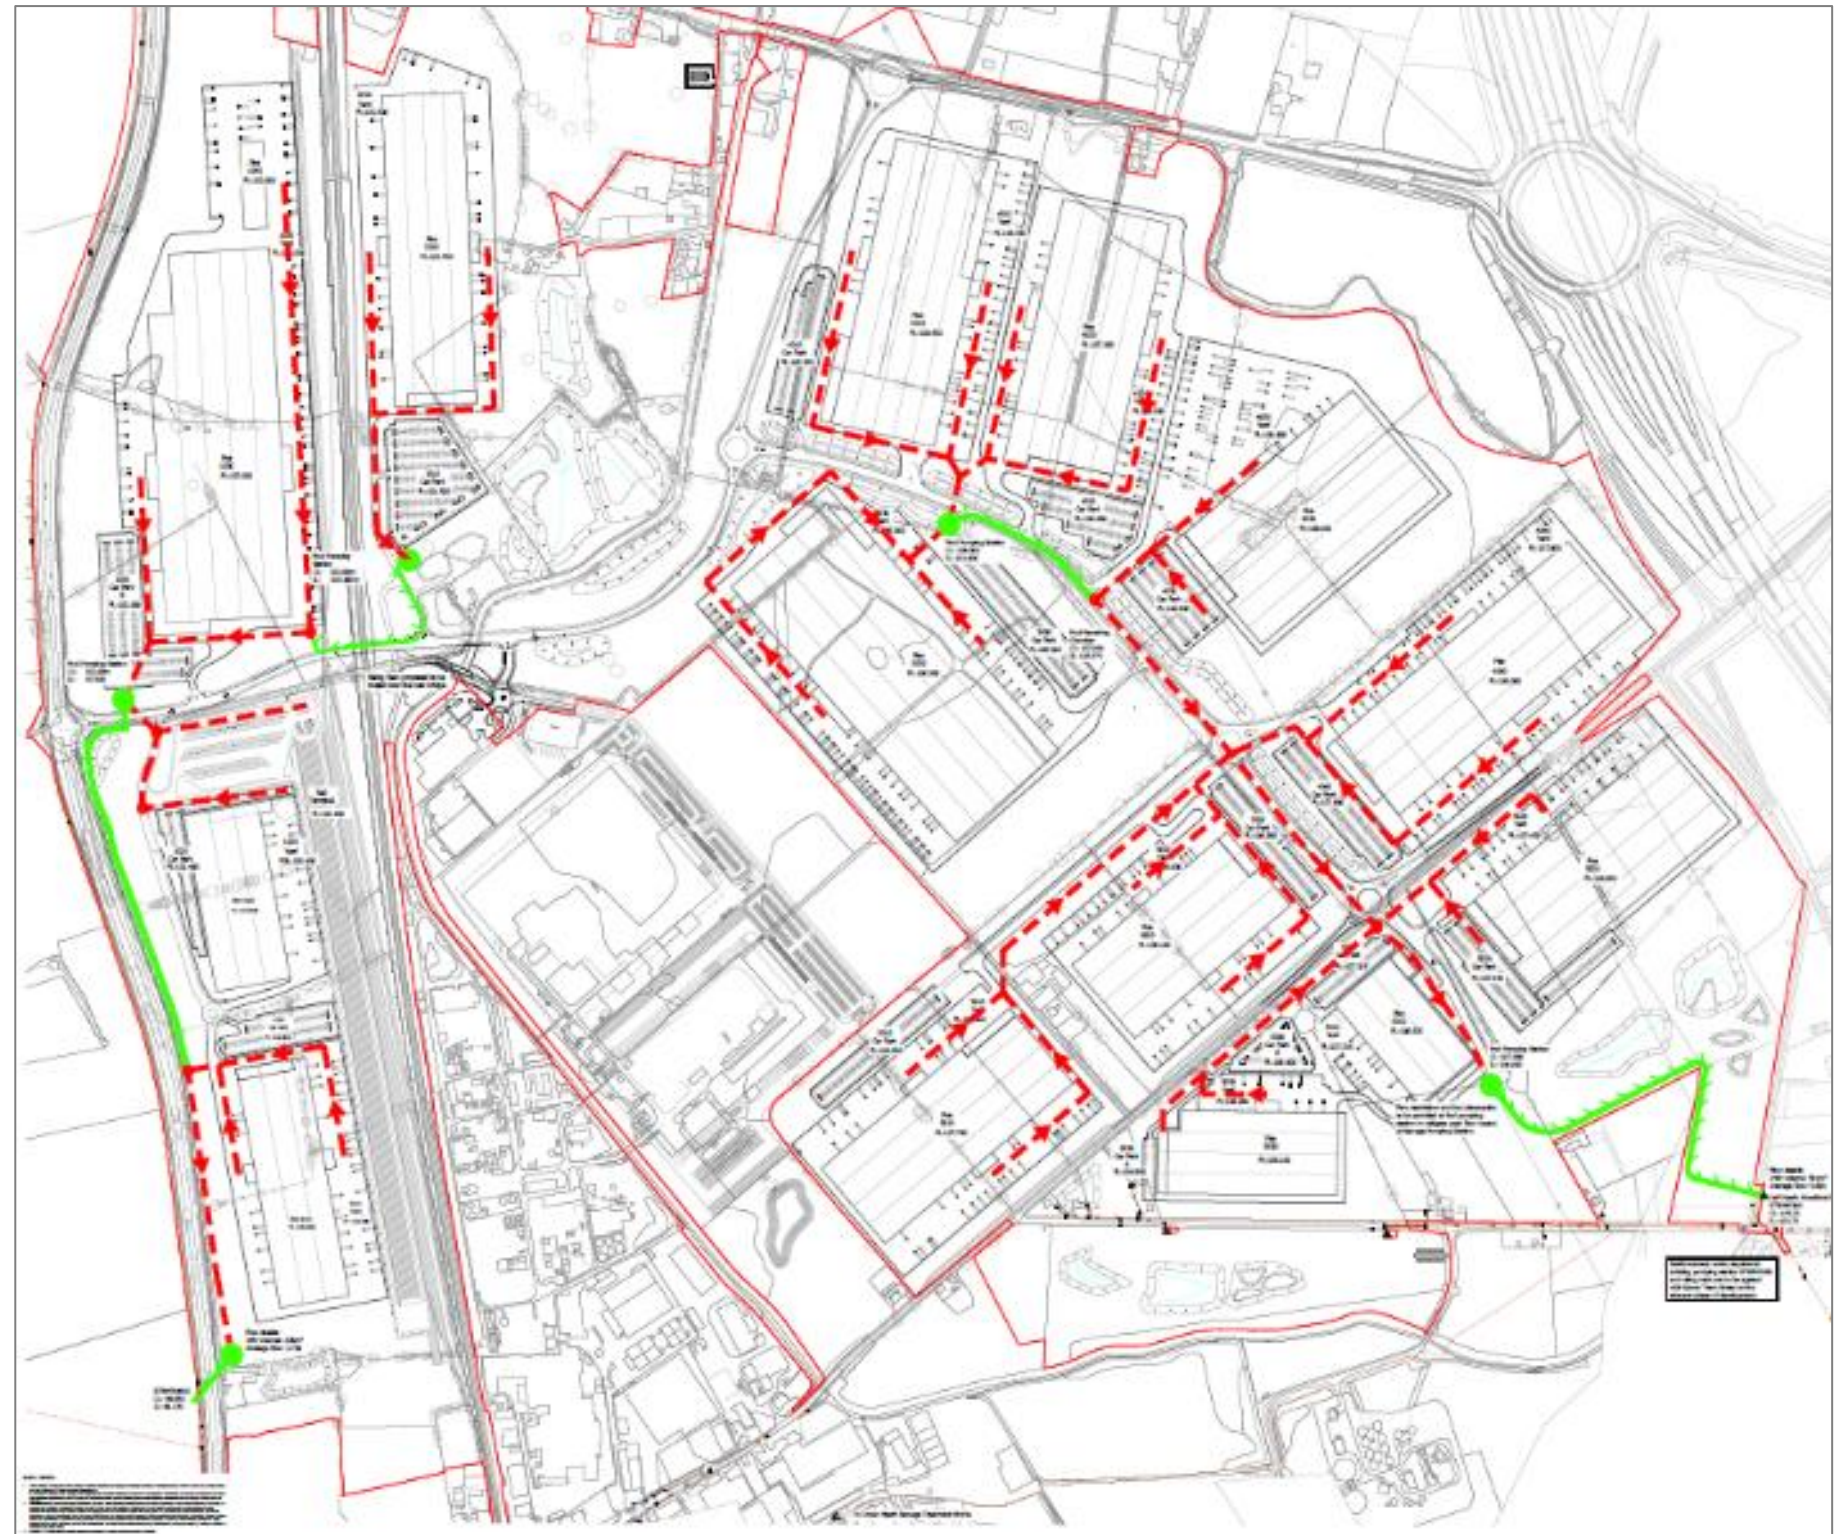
Illustrative Proposed Foul Water Drainage Layout
